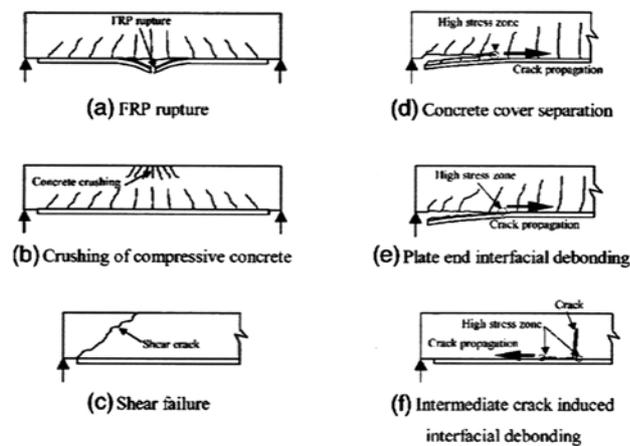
Failure modes of FRP-strengthened RC beams, (a) FRP rupture; (b) Crushing of compressive concrete; (c) Shear failure; (d) Concrete cover separation; (e) Plate end interfacial debonding; (f) Intermediate crack induced interfacial debonding [1].
